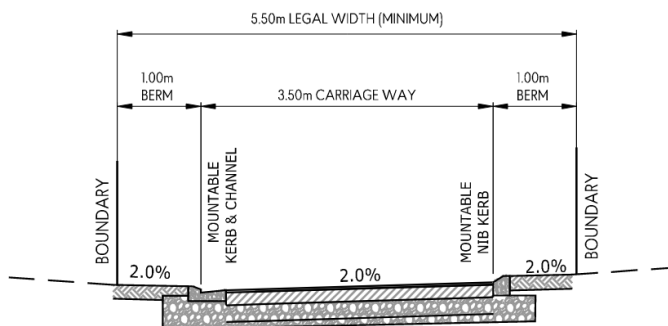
Typical JOAL Cross-Section (3) - 5.5m Minimum
